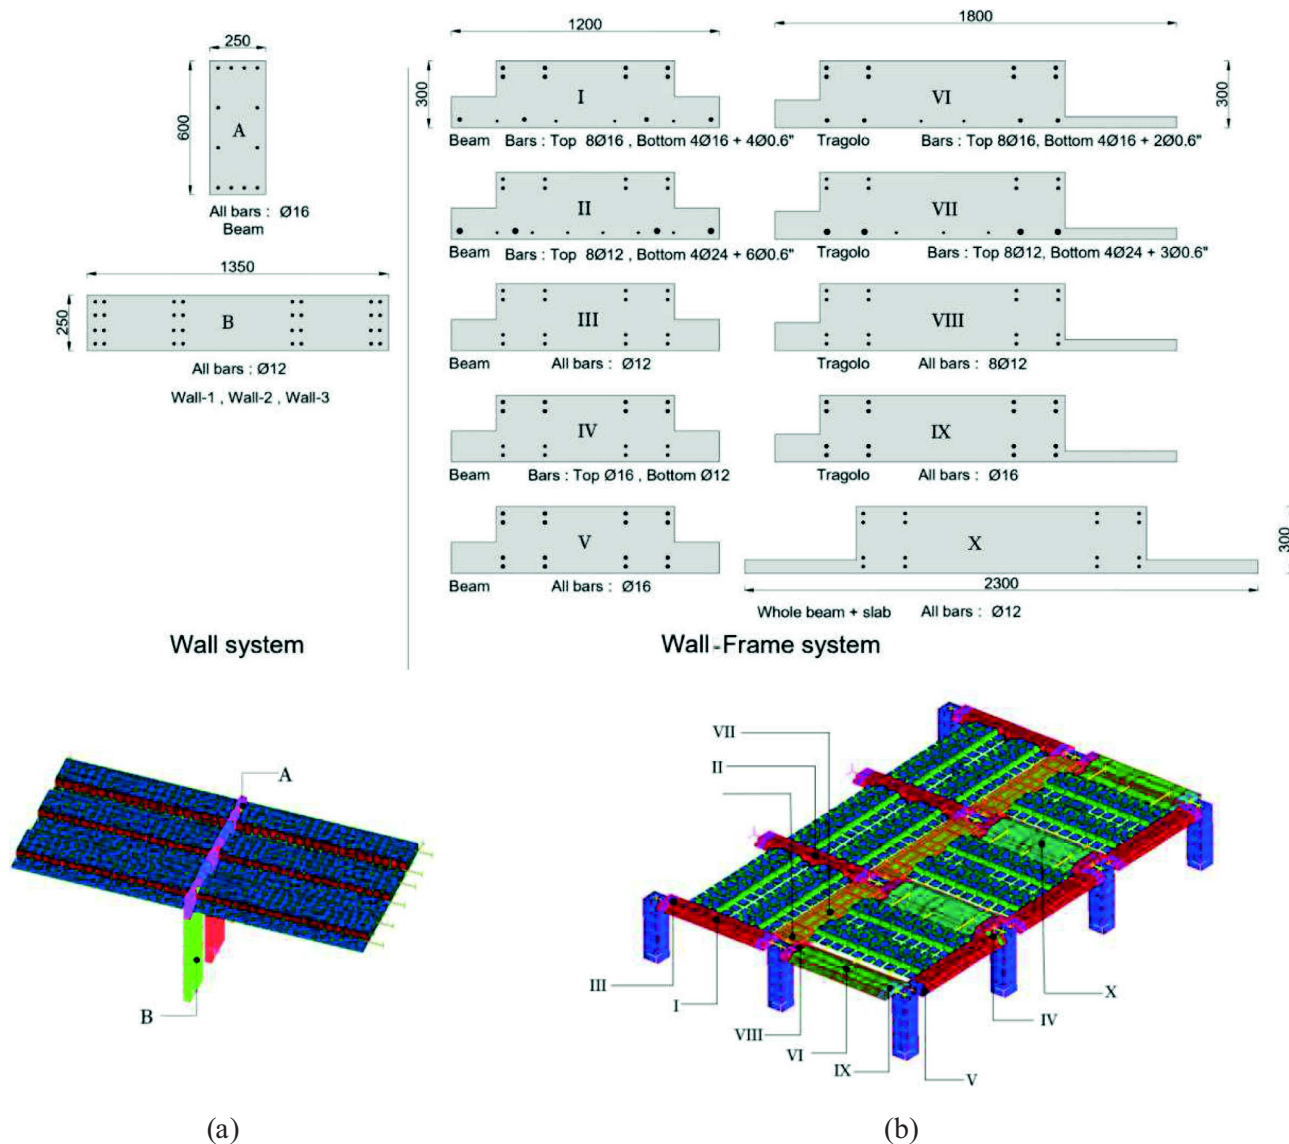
| Cross sections of the primary structural elements: (a) wall system and (b) coupled wall-frame system.
